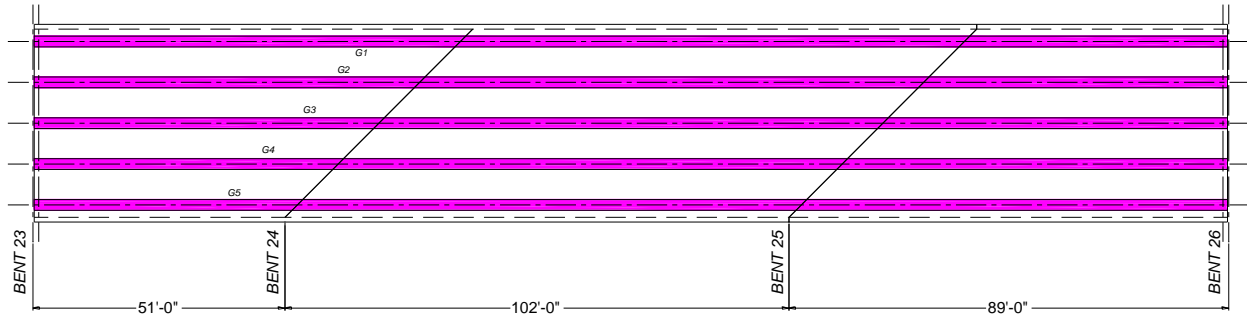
Plan view of Bridge #2 showing different girders and spans
